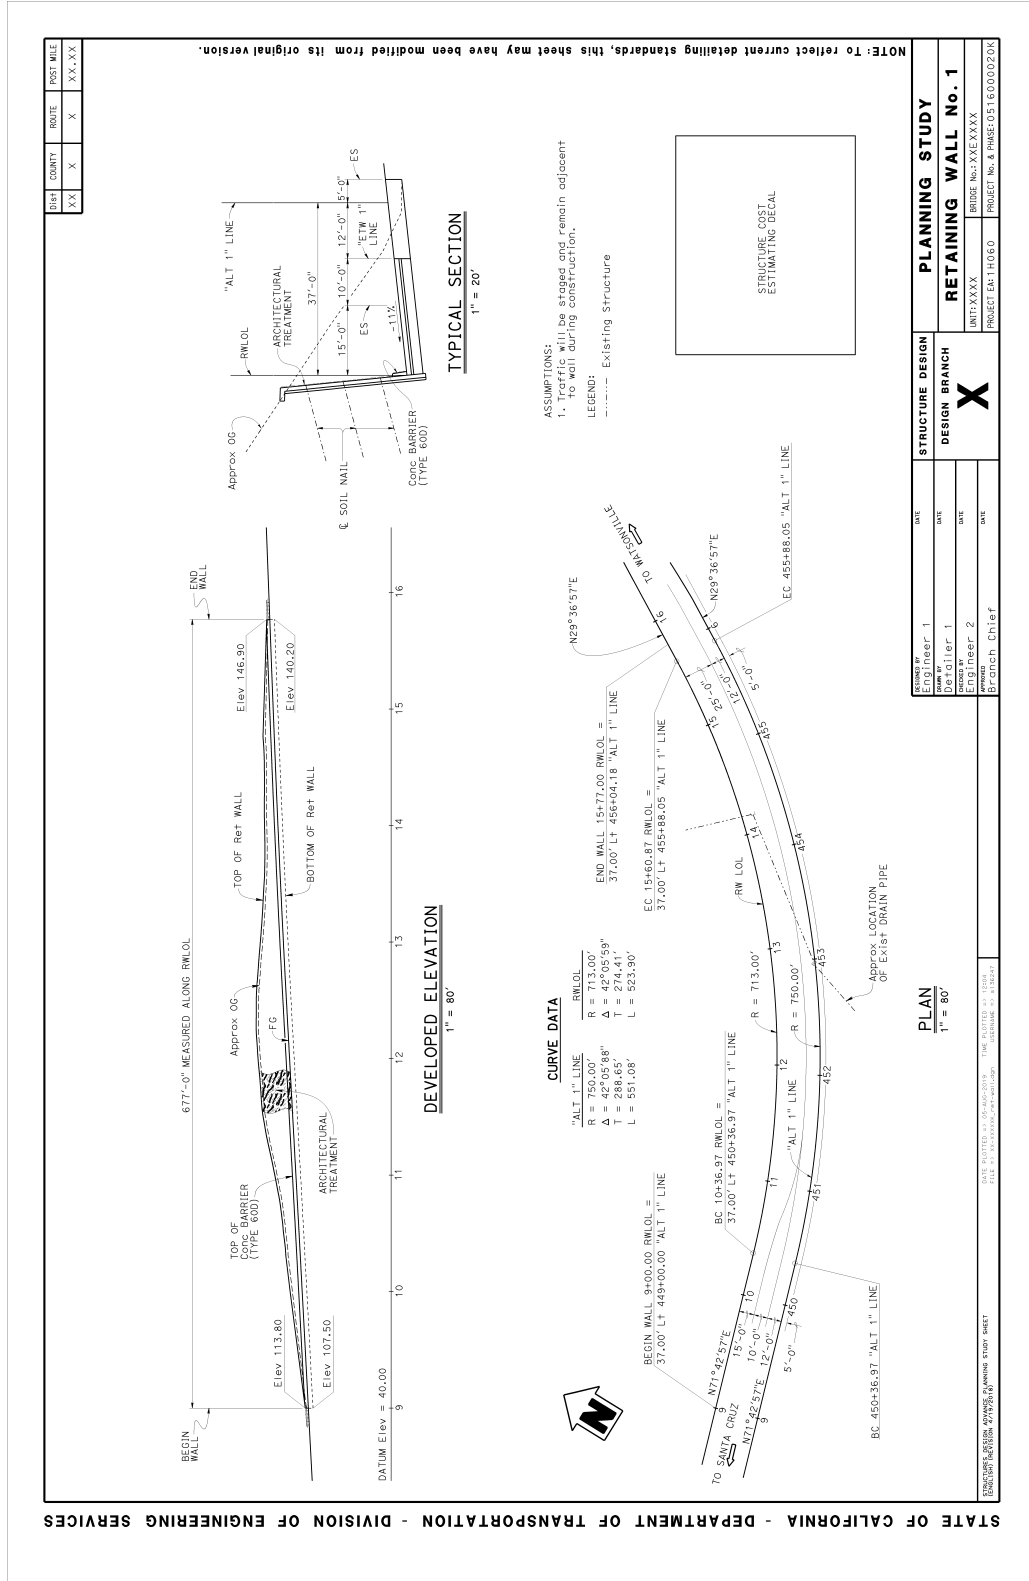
A.B.6 Advance Planning Study Detailing Example 6
